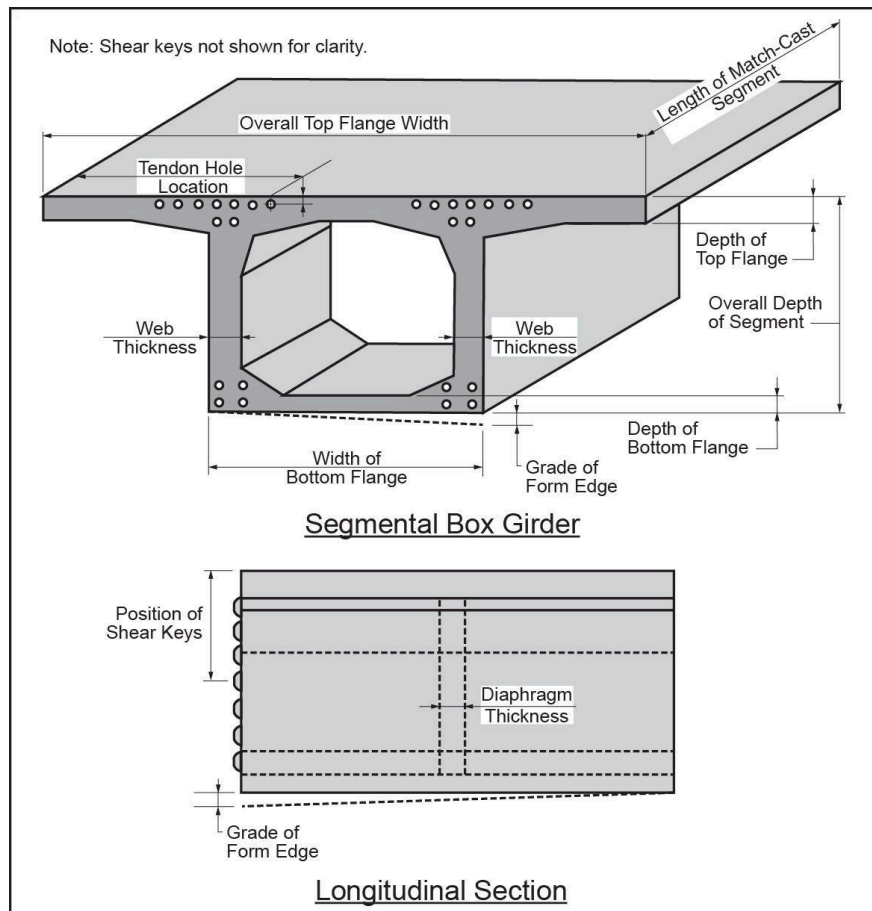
Commonly Specified Tolerances for Segmental Box Girder Bridge Construction
